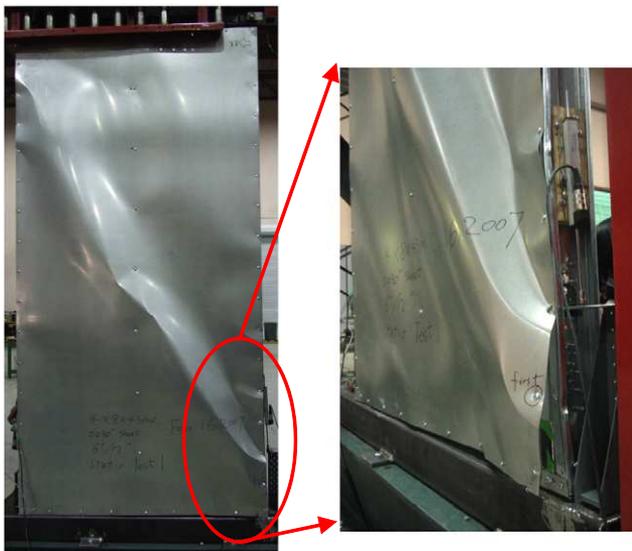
Sheathing buckling and screw pullout on a 2.44 m × 1.22 m wall in monotonic test.
